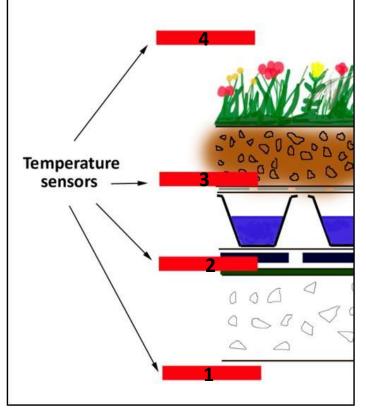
Plan of temperature senor monitoring equipment within the green roof test bay profiles at Barking Riverside Offices.
